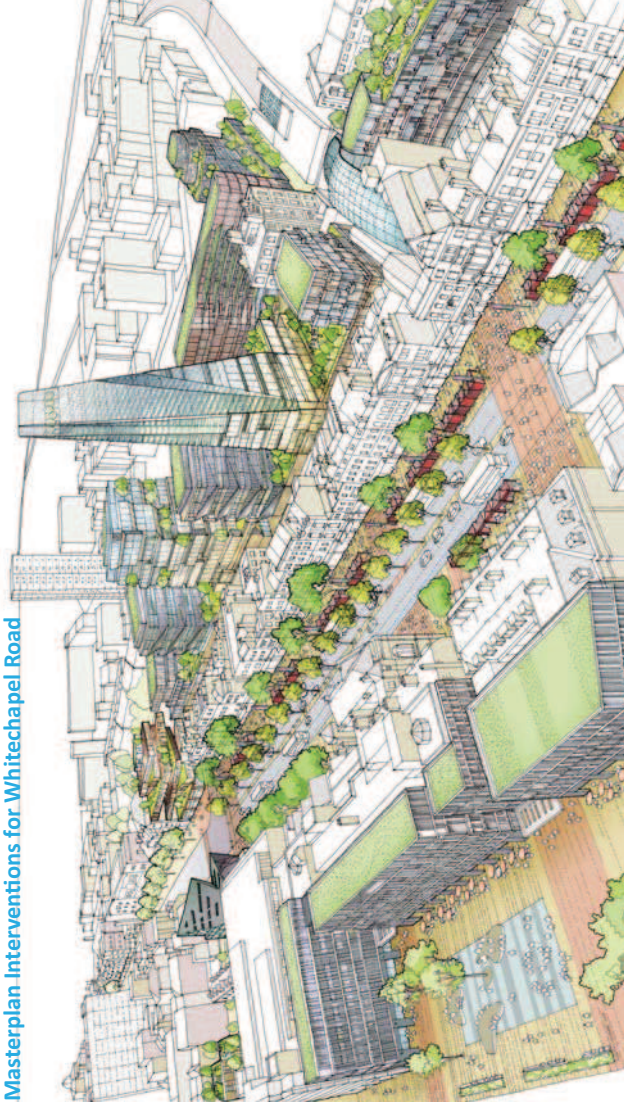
Birds-eye view looking northwest ward across Whitechapel Road
